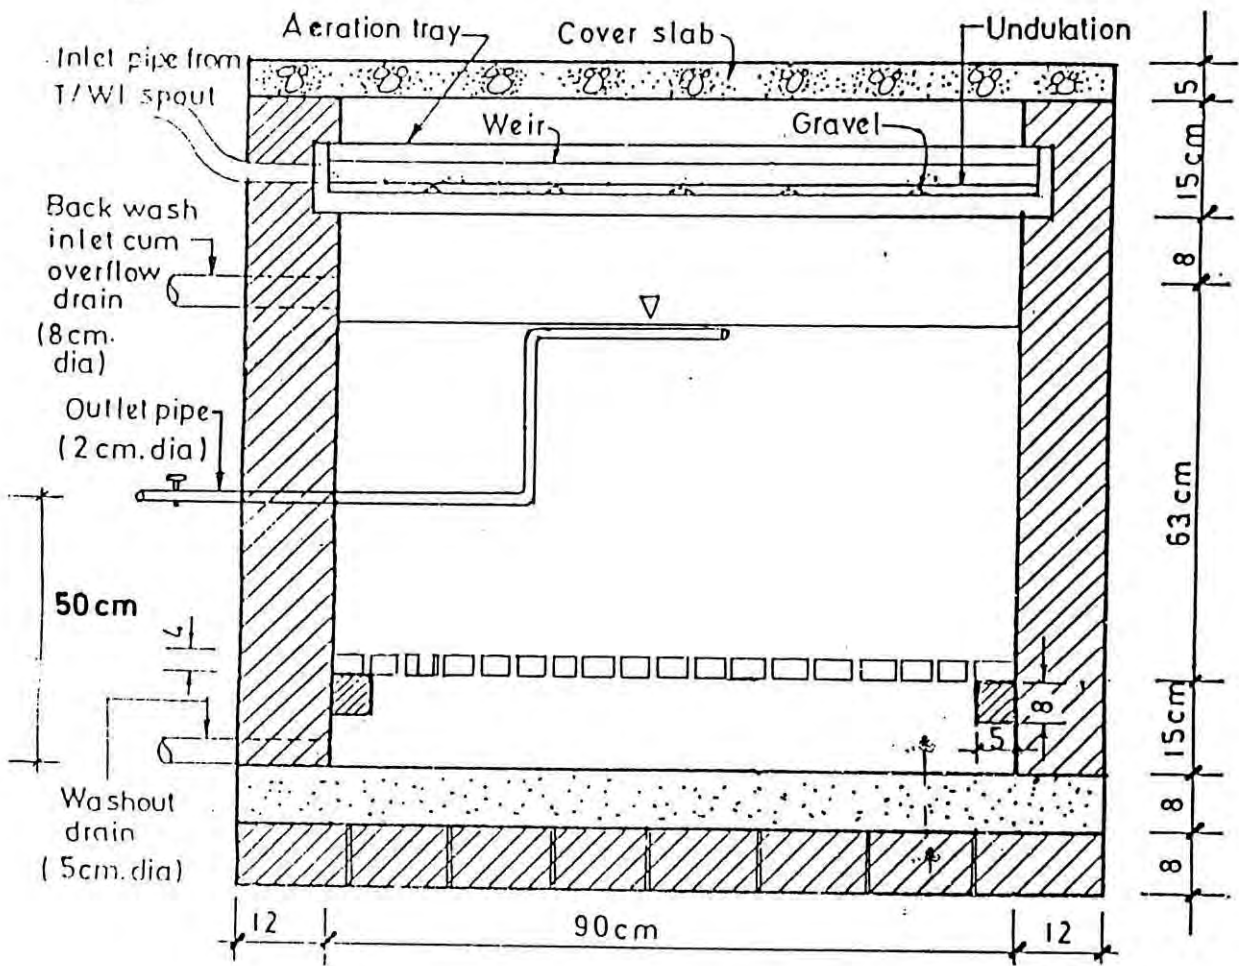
a TRANSVERSE SECTION Y – Y OF THE MODIFIED PLANT
